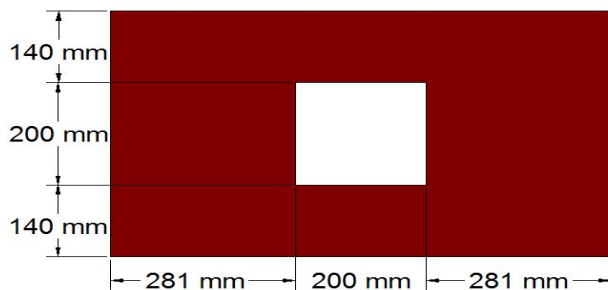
(c) Masonry wall with opening at the center of size 200×200
